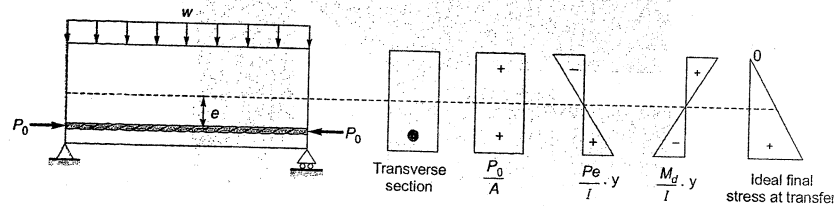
Variation of stresses in the transverse section of an eccentrically prestressed beam
